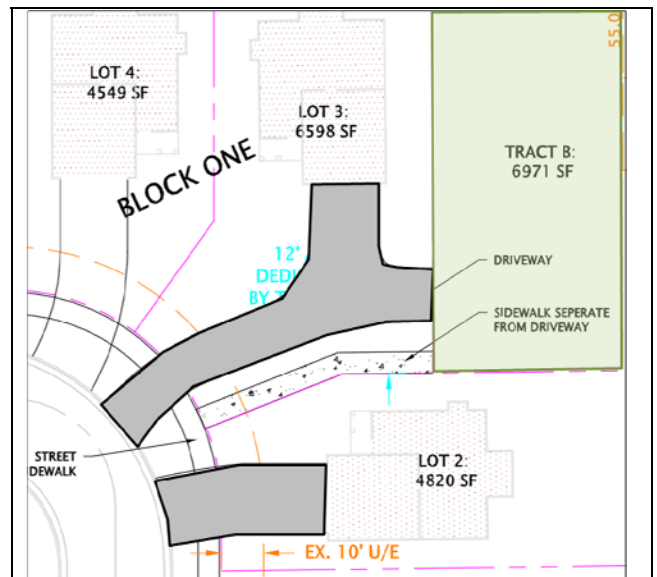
Applicant's proposed layout to reduce pedestrian/vehicular conflict on pedestrian access easement on Lot 3 Block One. FDP shall be revised to reflect this layout.
